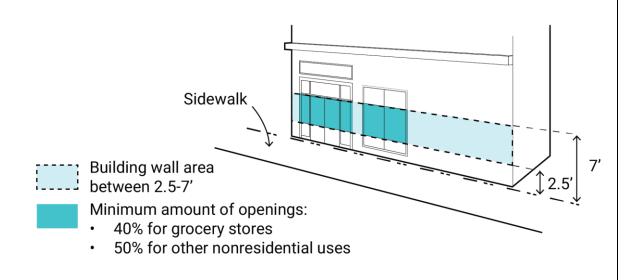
(B)(6)(a): Nonresidential window openings and transparency
